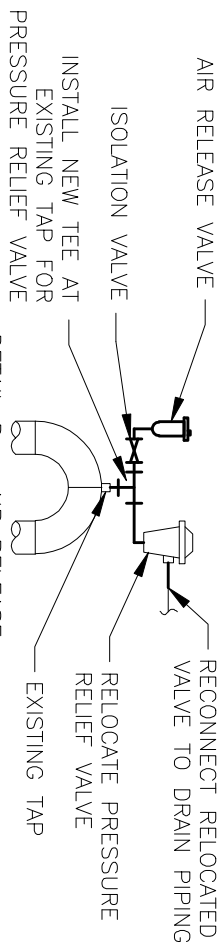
DETAIL B - REVISED TANDEM VALVE CONFIGURATION
